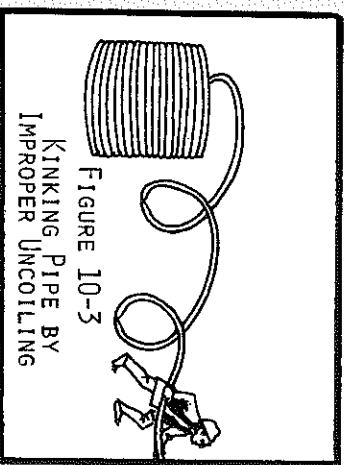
KINKING PIPE BY IMPROPER UNCOILING
